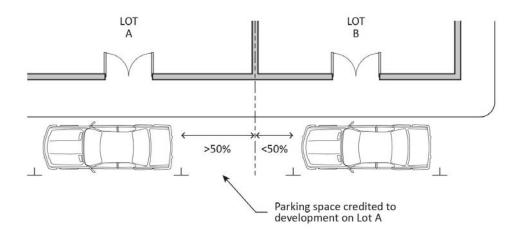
D.1.A: ON-STREET PARKING CREDIT
